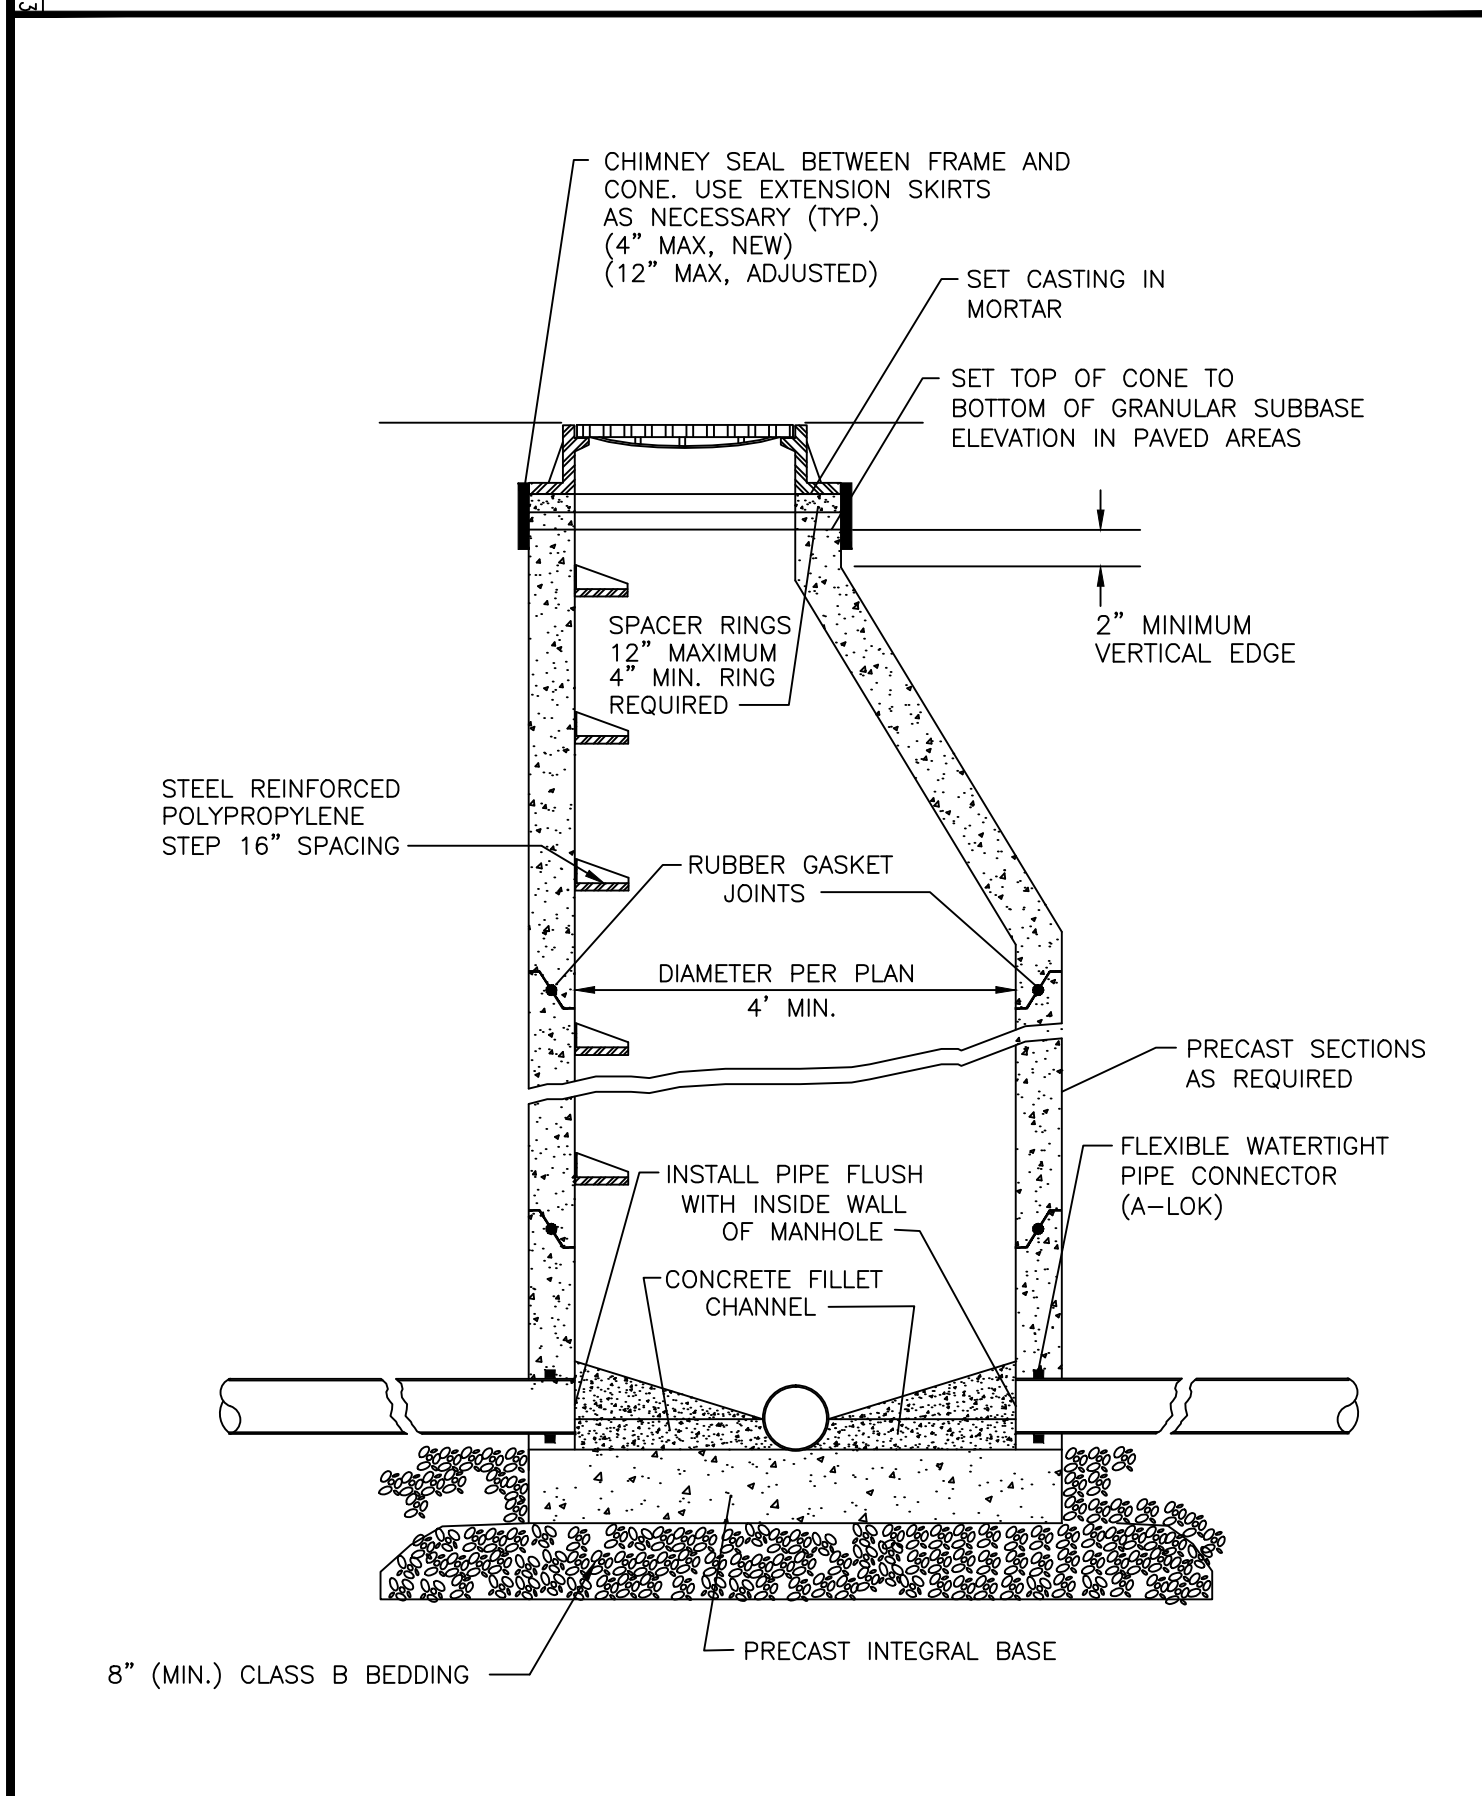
STANDARD ROADPLAN	REVISION
